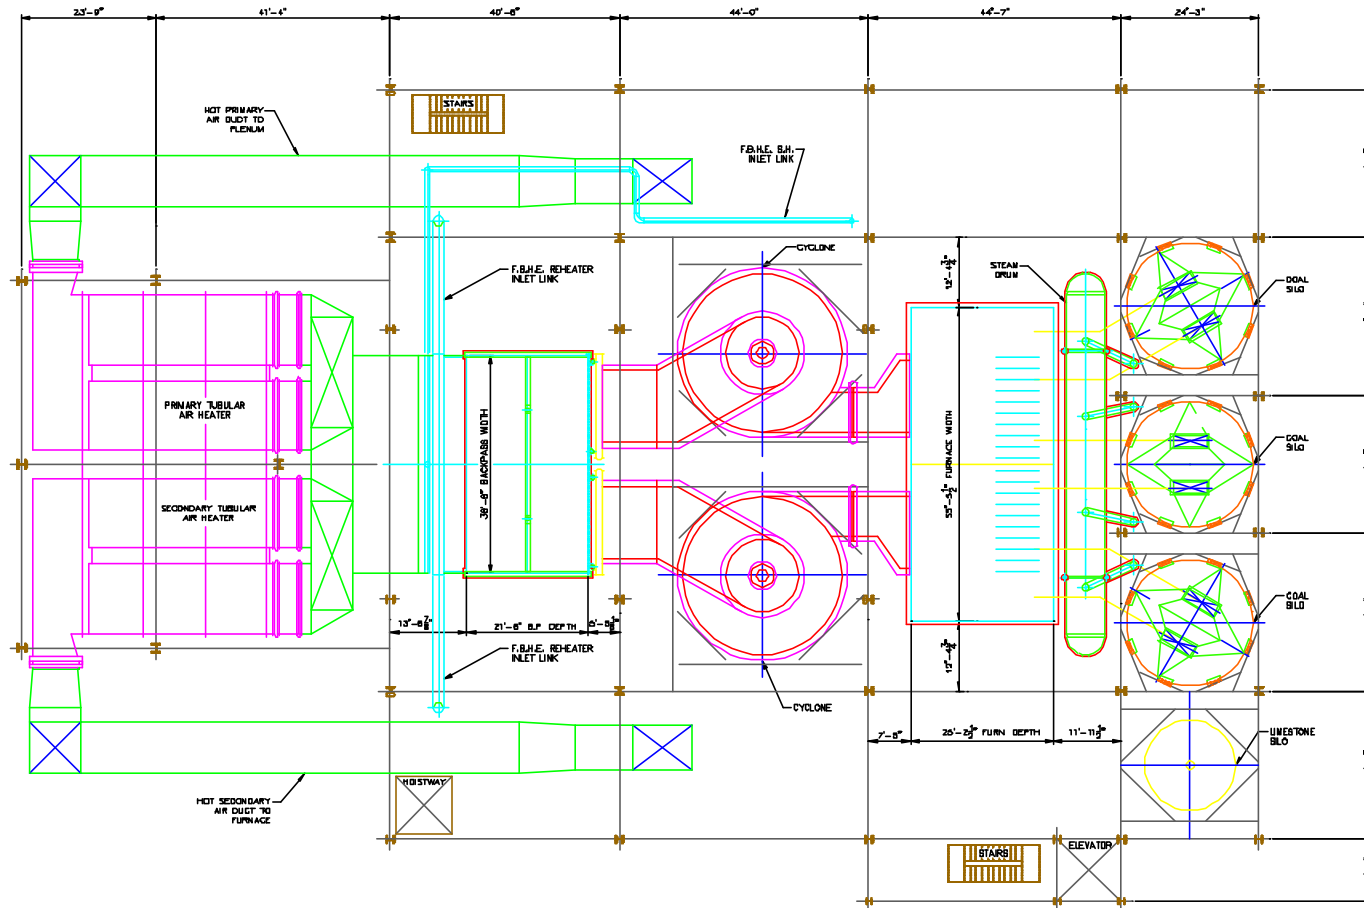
3: Case-1 Boiler Island General Arrangement Drawing - Plan View of Nominal 210 MW-gross CFB Steam Generator
